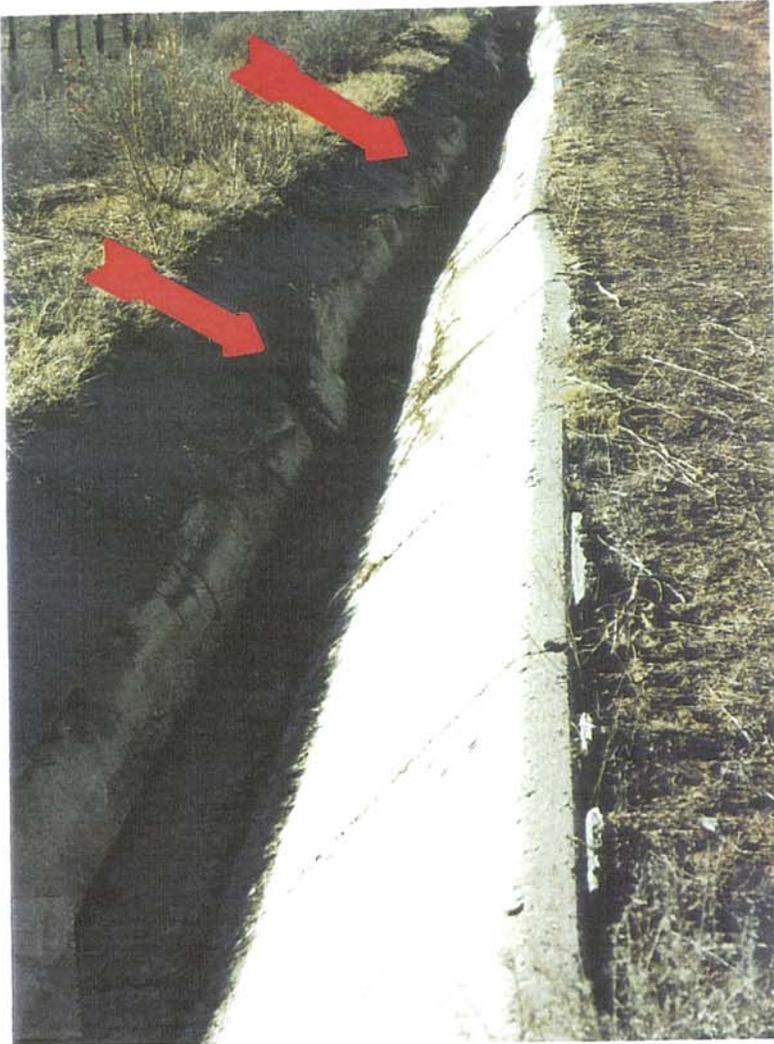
Sandoval Ditch (Acoma Pueblo) - Typical deteriorated concrete ditch.
